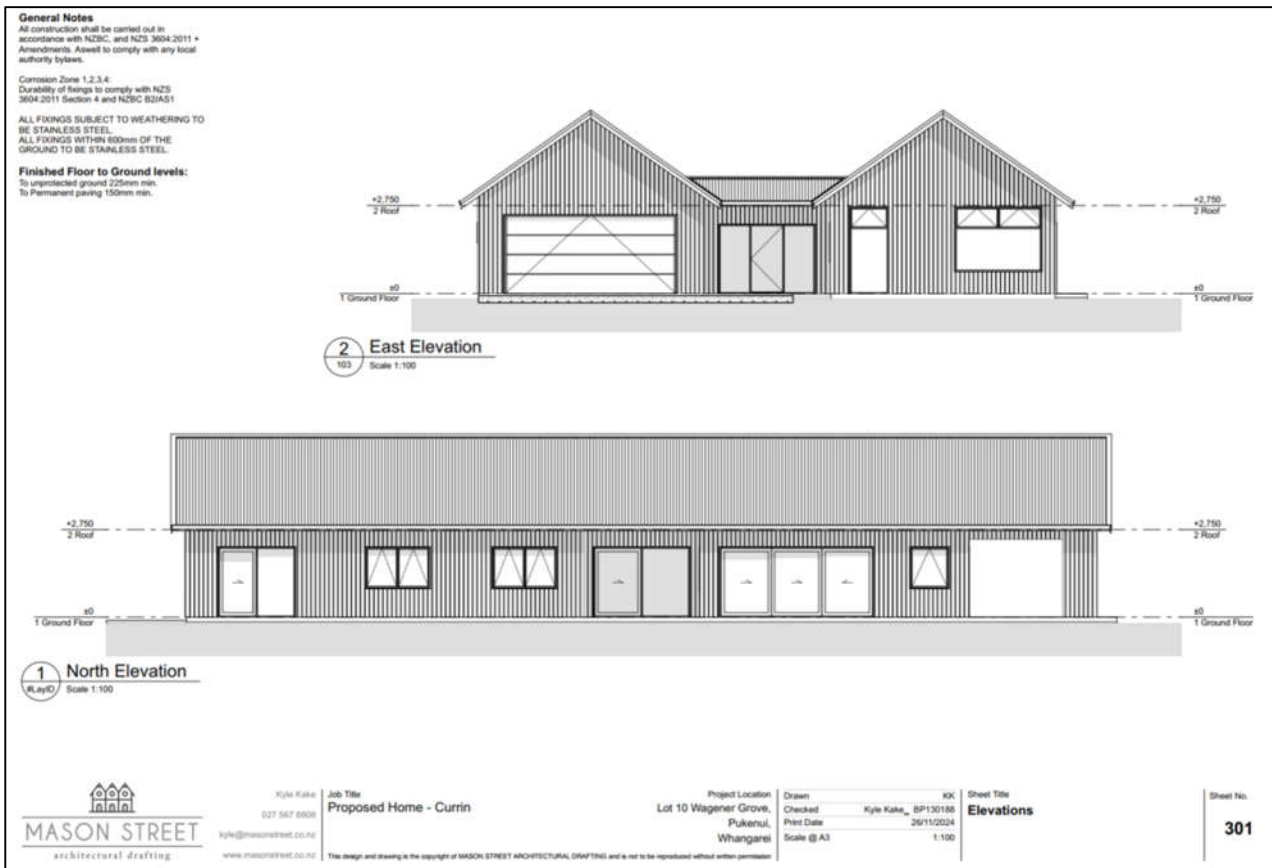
Screenshot of the East-North Elevation Plan from the supplied architectural drawings.
